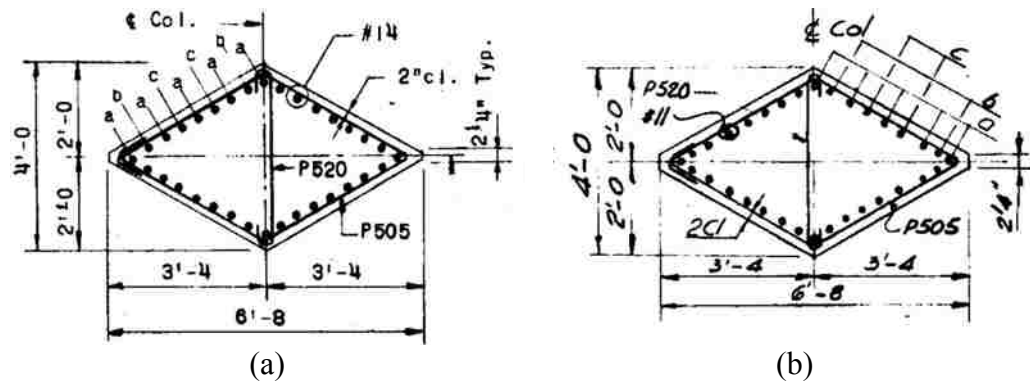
Bridge G-947 - Column section for (a) bent 1 and (b) bent 2
